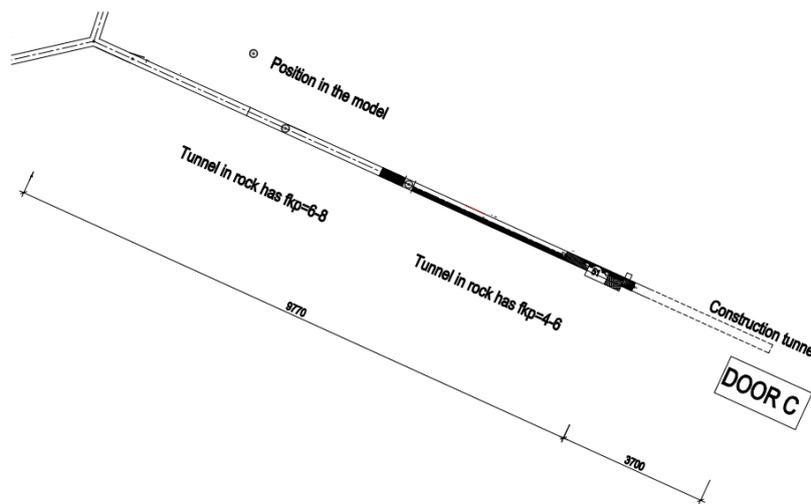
Plan of a tunnel section near gate C (size in the picture is cm).
